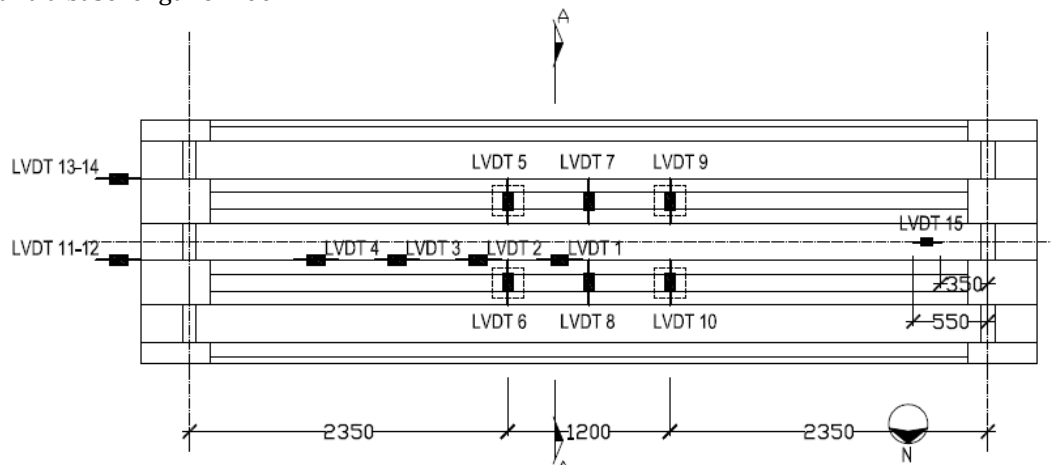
LB1 - Bottom view. Position of LVDT 1-15. LVDT 15 position at the west end of beam 2 to replace FO-S2-7.
